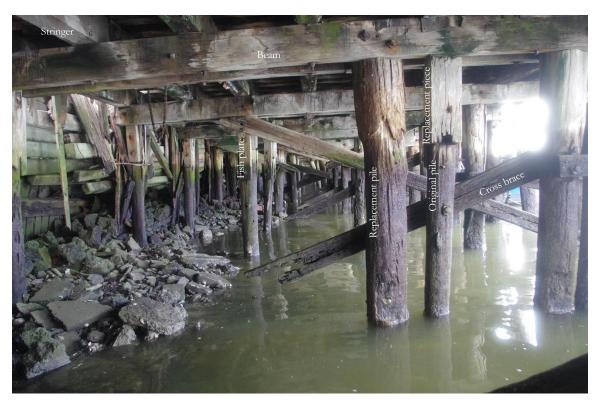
No.2 wharf typical arrangement of bent and repair work (15.07.2021).
